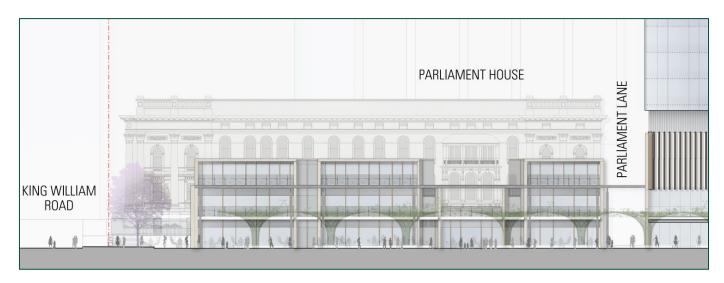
Current Approved Retail Pavilion Building Southern Elevation (Source: JPW)
